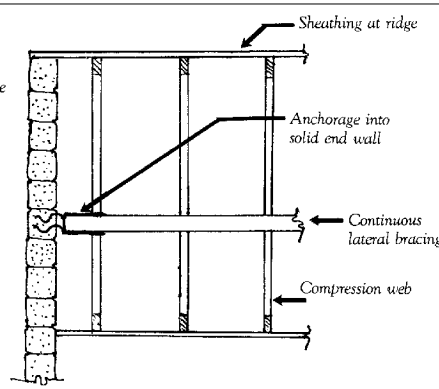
Trusses can be anchored to a solid end wall to secure lateral bracing of the web members.
